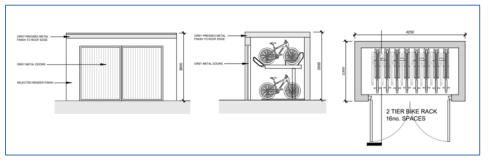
Extract from Bike Store Drawings, prepared by Deady Gahan Architects.
